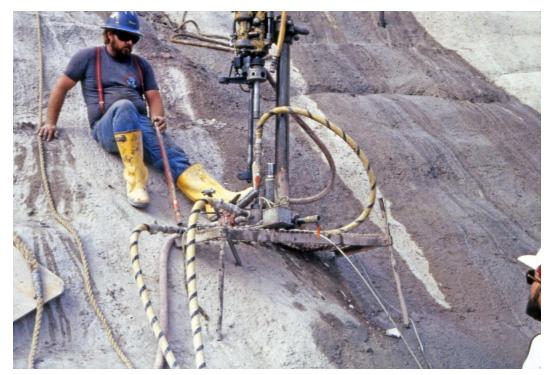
Supply and return grout circulation grout lines at the grout manifold.
